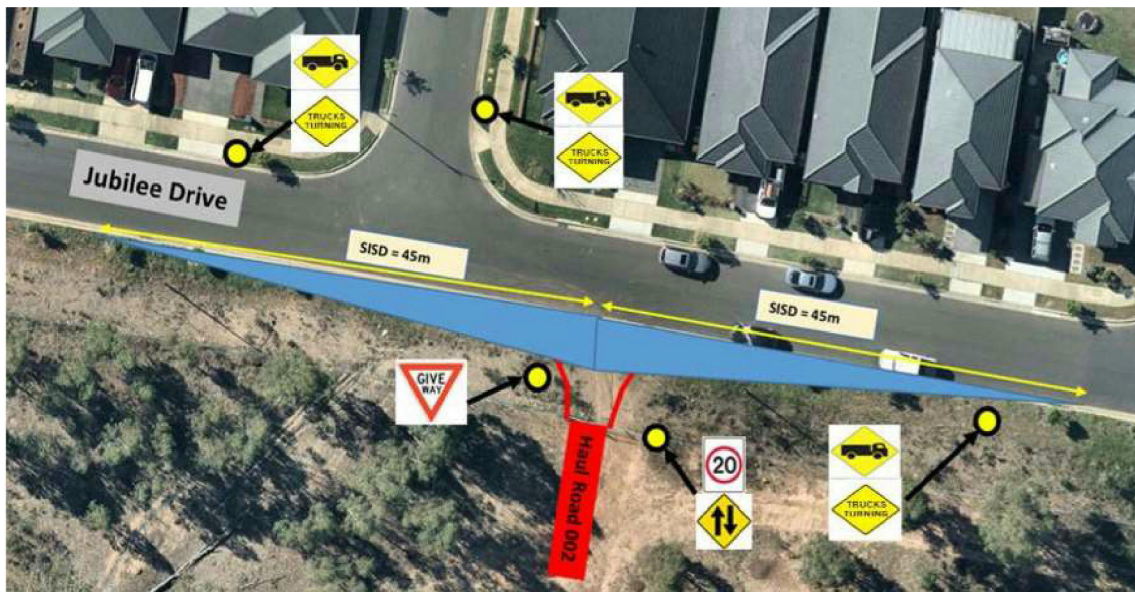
Proposed temporary signage plan for Jubilee Drive/Haul Road 002 intersection (Source: Cardno)
